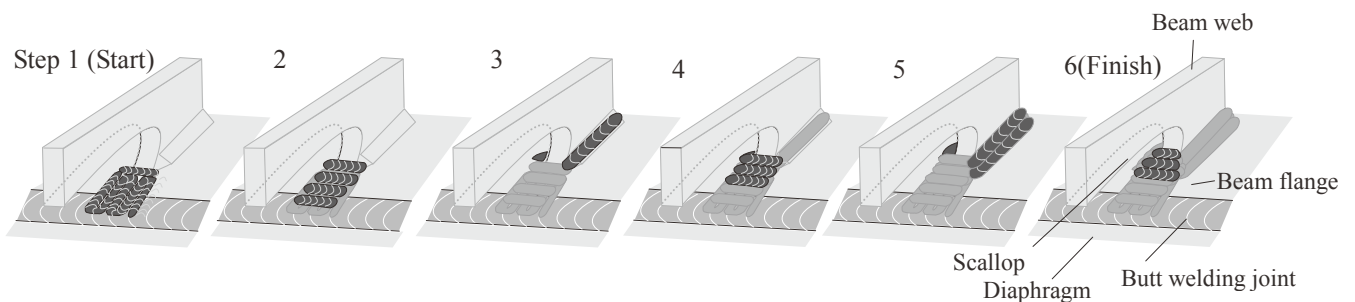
Welding pass sequence of the overlay welding method around toe of scallop
